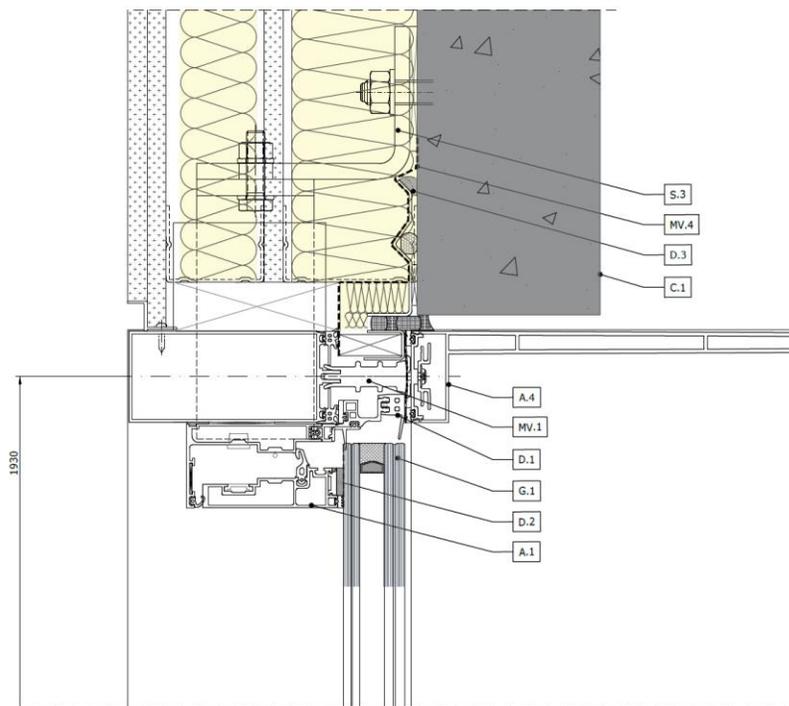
East Elevation WT-1C façade module typical Section Detail 1. Source: Author
